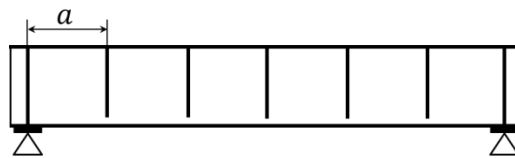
Girder with Intermediate Transverse Stiffeners
